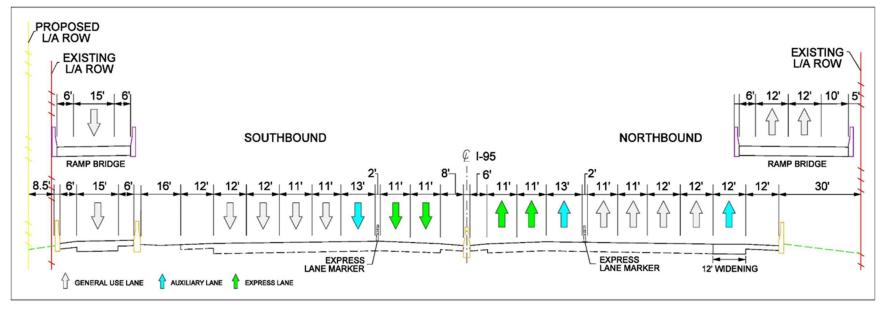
I-95 Alternative 2 Roadway Section North of Hallandale Beach Boulevard
